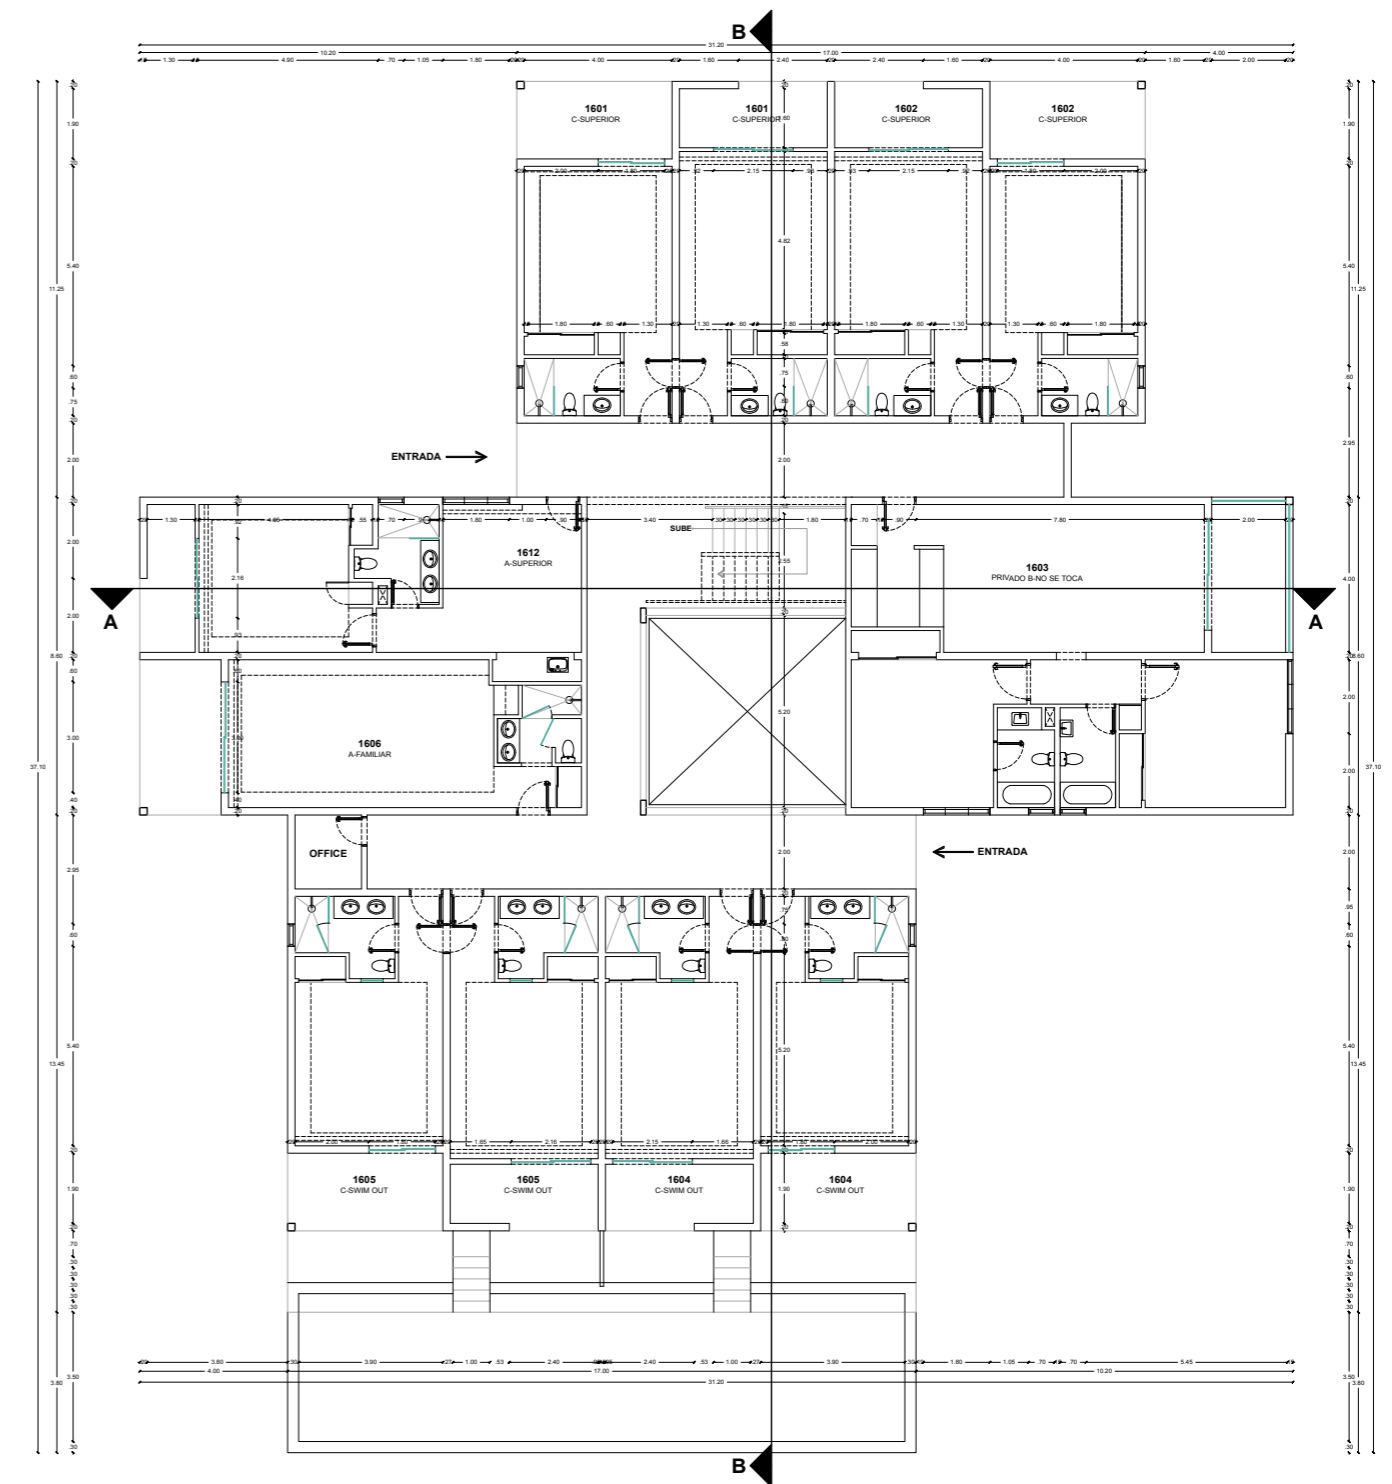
Dimensioned Ground Floor Plan of Guest Block 16. Source: Emotions by Hodelpa (2021)
